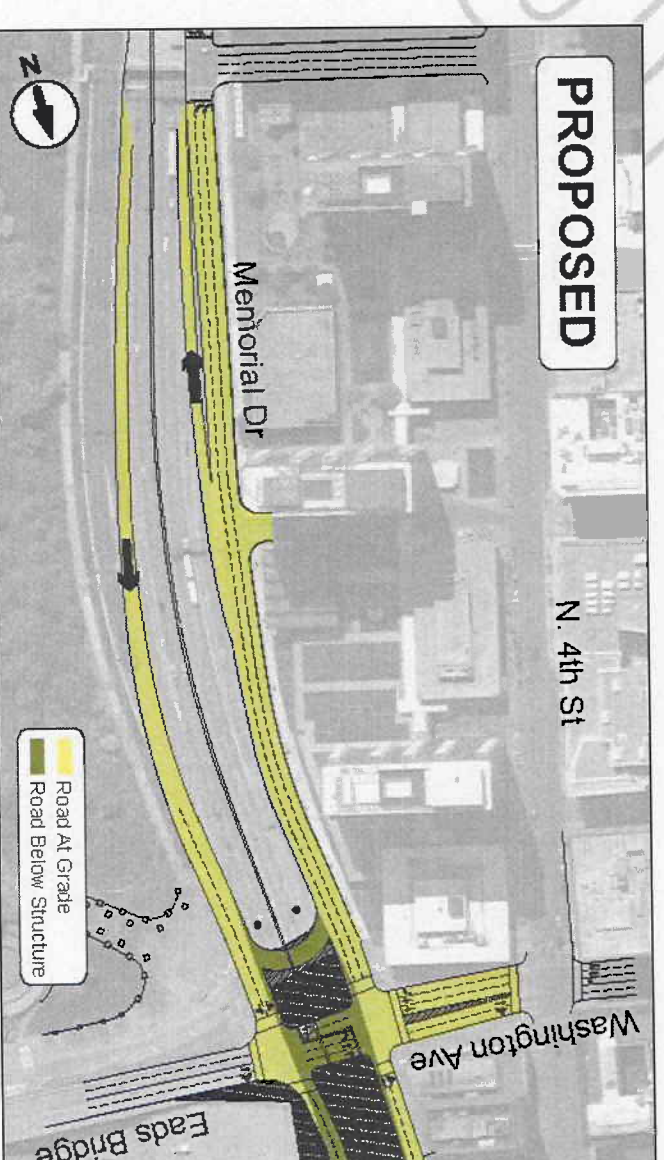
Proposed Layout of Washington Avenue Ramps and U-Turn
